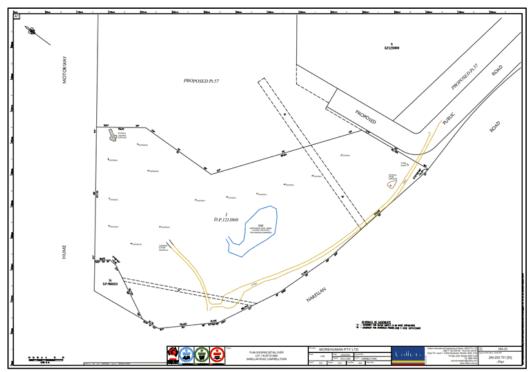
Survey Plan of the existing placement of the Stations at the subject site
